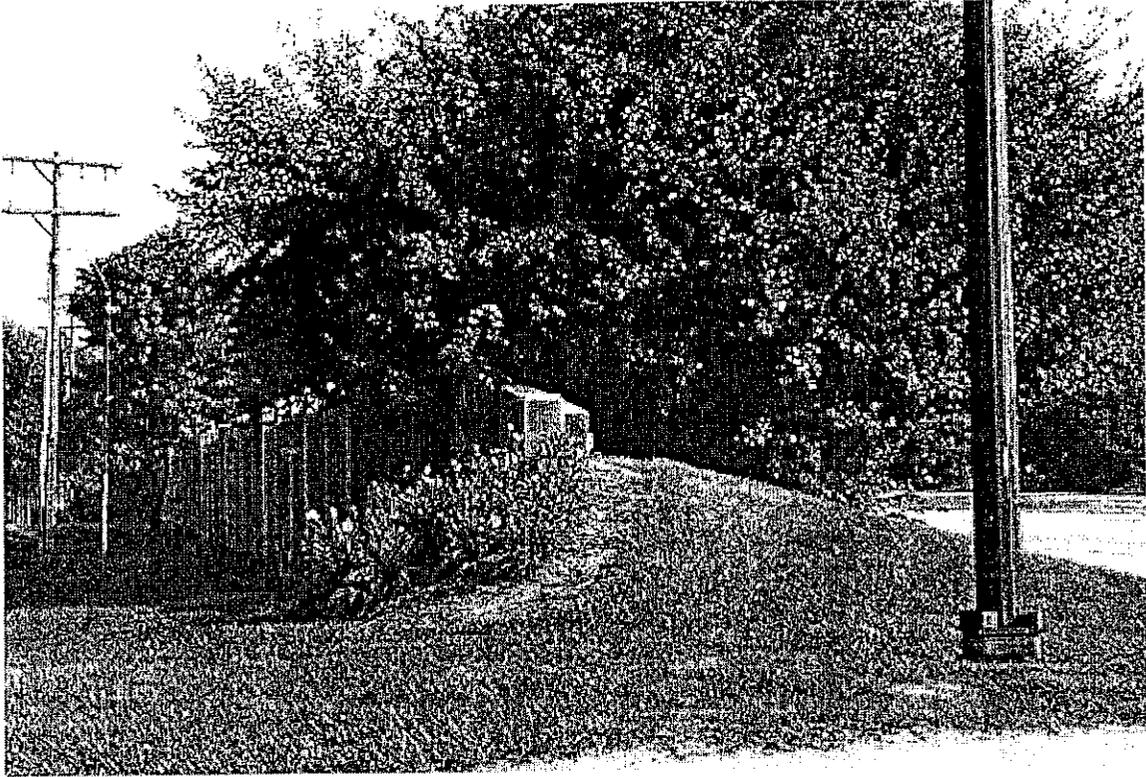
Earth berm/retaining wall, IL 4, Springfield.
